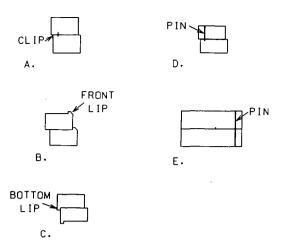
Retaining wall systems tested: (a) Stonewall, (b) Allan, (c) Diamond, (d) Versa-Lok, (e) Rockwood.
